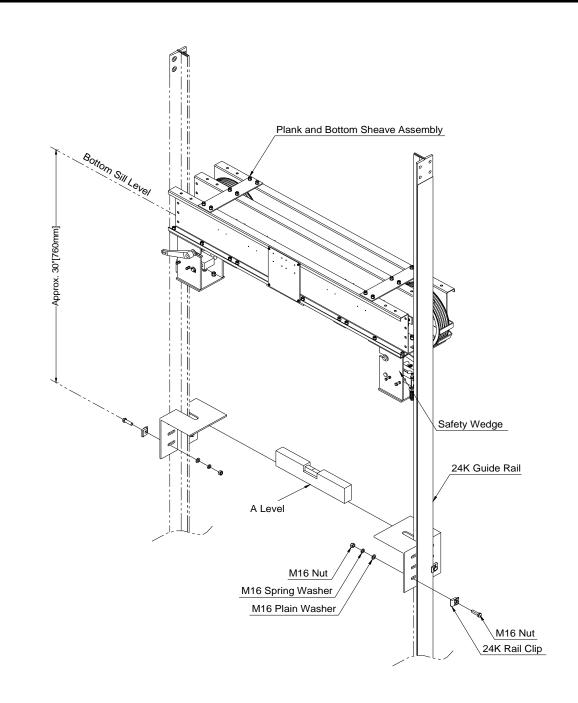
A. PLANK and BOTTOM SHEAVE ASSEMBLY INSTALLATION (Underslung Fork type)
